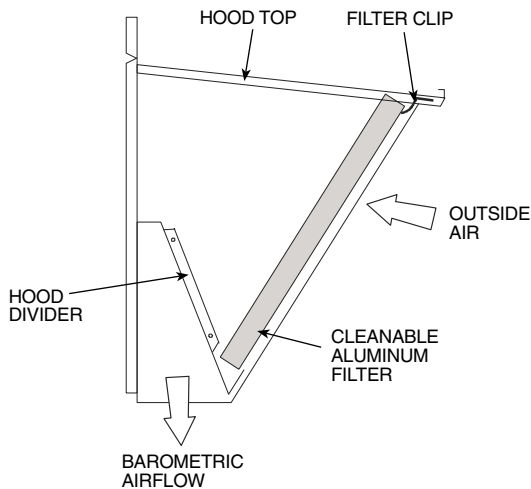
Filter Installation (3 to 12¹/₂ Ton Units)
